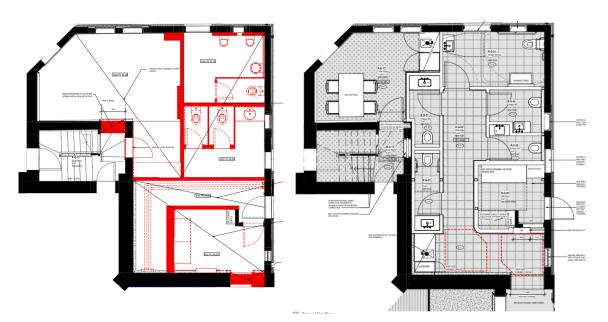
Proposed Demolition Amenities Upgrade Plan. Source: Trethowan Architecture, 2024.
